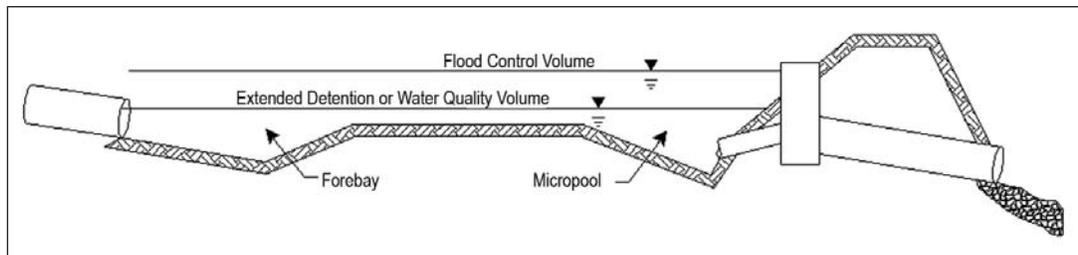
Storm Water Pond with Extended Detention and Flood Control Volumes
